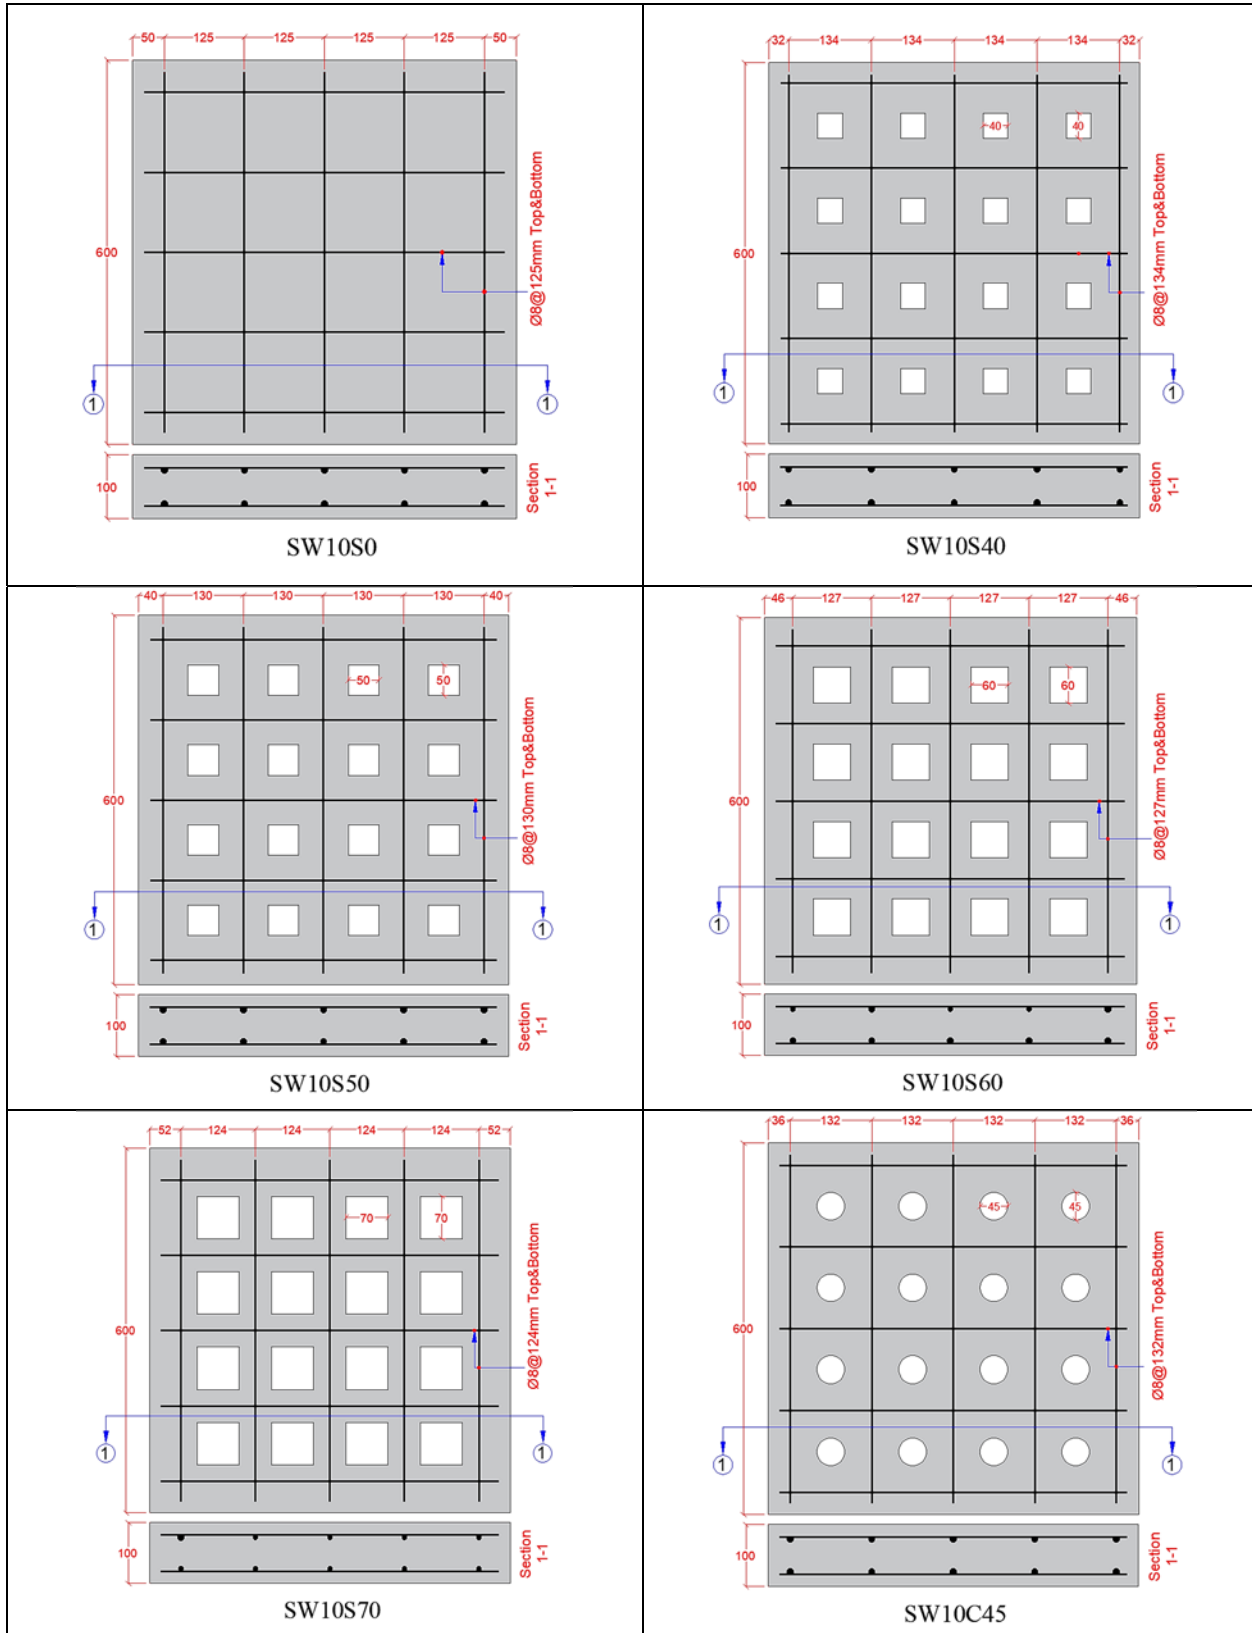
Details of specimens for models SW10S0 to SW10C45.
